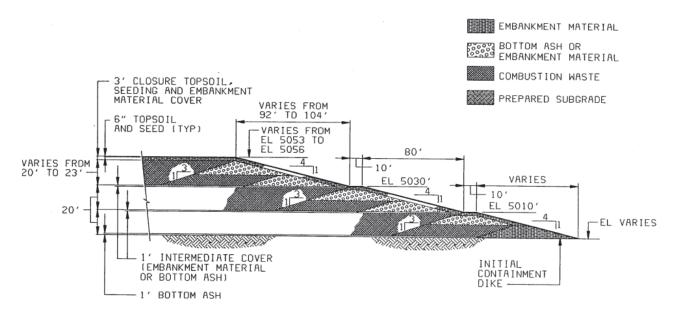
Cross Section of Final Landfill Configuration [2]
